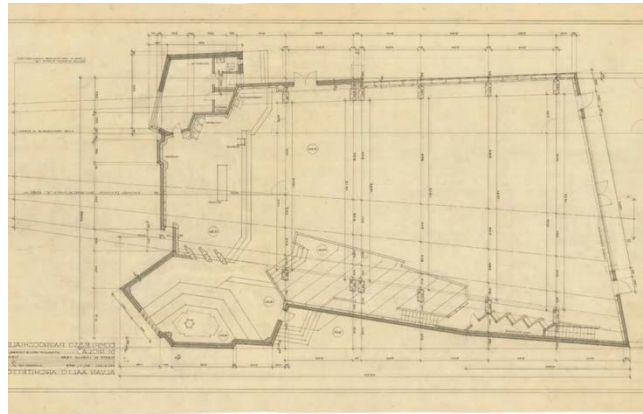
Ground Plan (Drawing by: Alvar Aalto Foundation) This floor plan showcases how the church's structure was built using geometry. When viewed from above, the baptistery side (bottom left) resembles tree rings, which relates to the surrounding forest. This detailed drawing clearly shows the location of the movable wall (bottom middle) and highlights the difference in scale between the two rooms.
